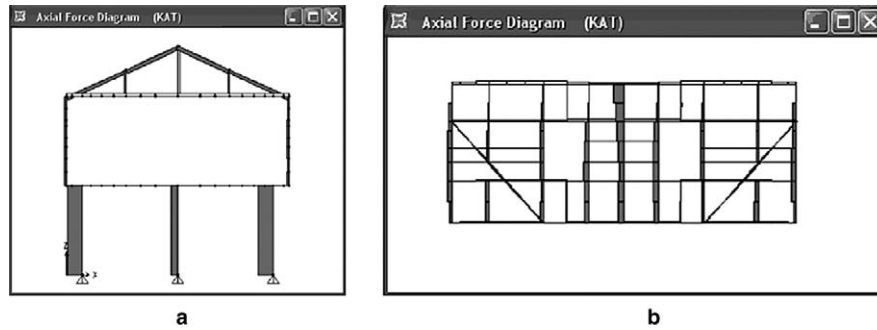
Axial forces in timber elements under vertical loads. (a) Columns in ground floor for fully demolished stone masonry: maximum calculated axial force = 55 kN, minimum resistance = 500 kN. (b) Timber framed walls: maximum calculated axial force = 11 kN, minimum resistance = 225 kN.
